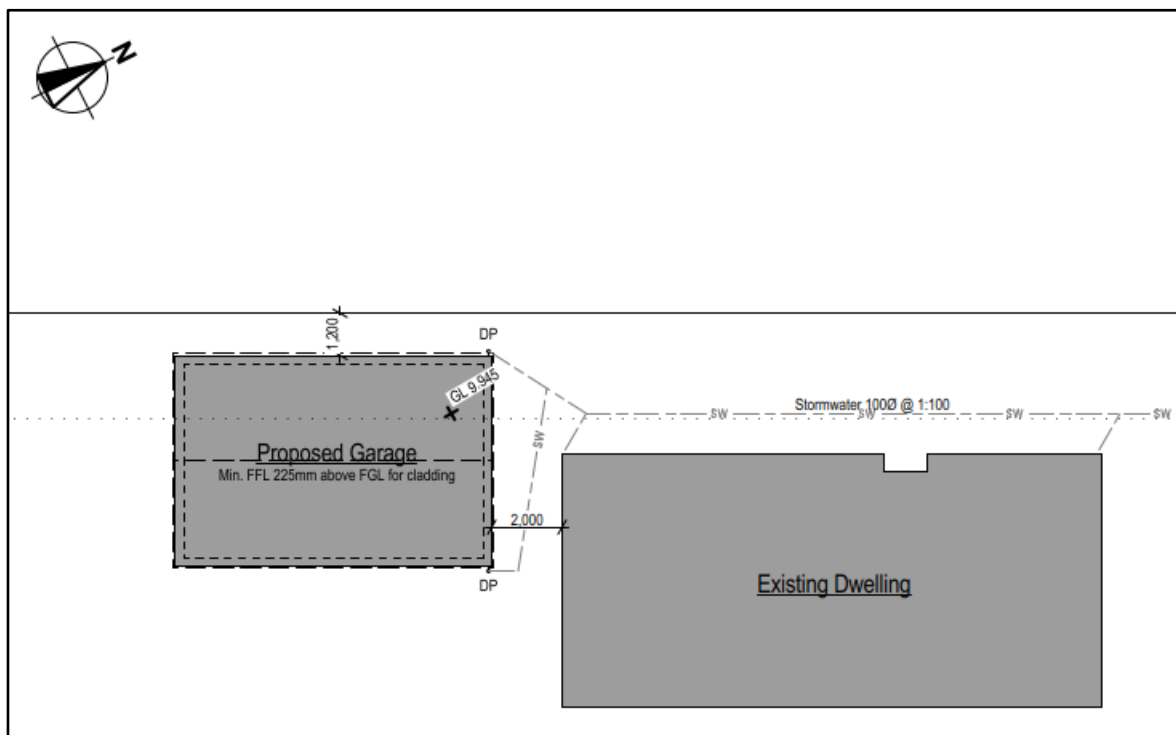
Site Plan (Source: Extract from BC22 1290 approved plans).
